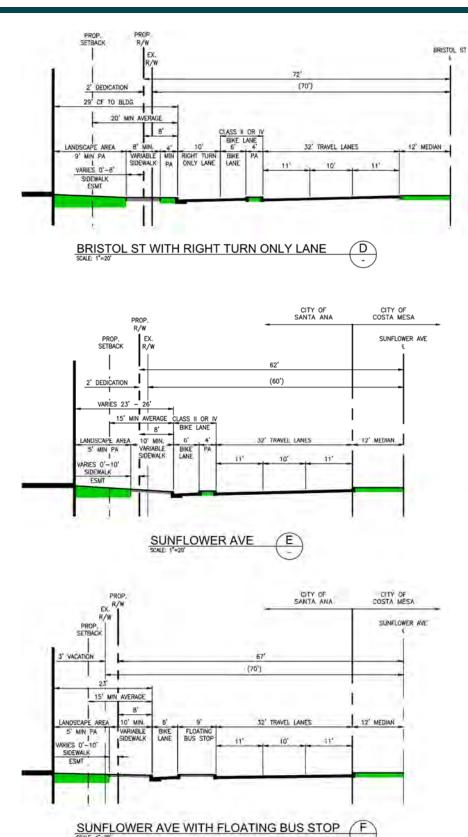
Street Cross Sections - Sunflower and Bristol
